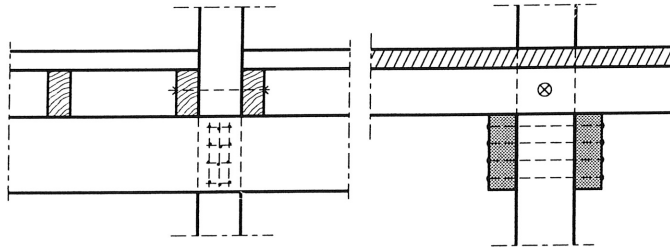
Spaced double beam connected by dowels or bolts to the column.
